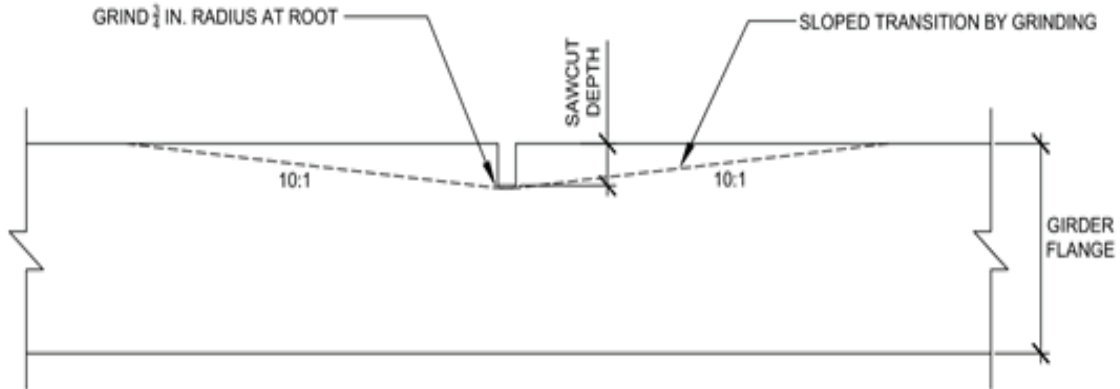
Girder flange elevation showing a typical grinding profile to repair a transverse saw cut
